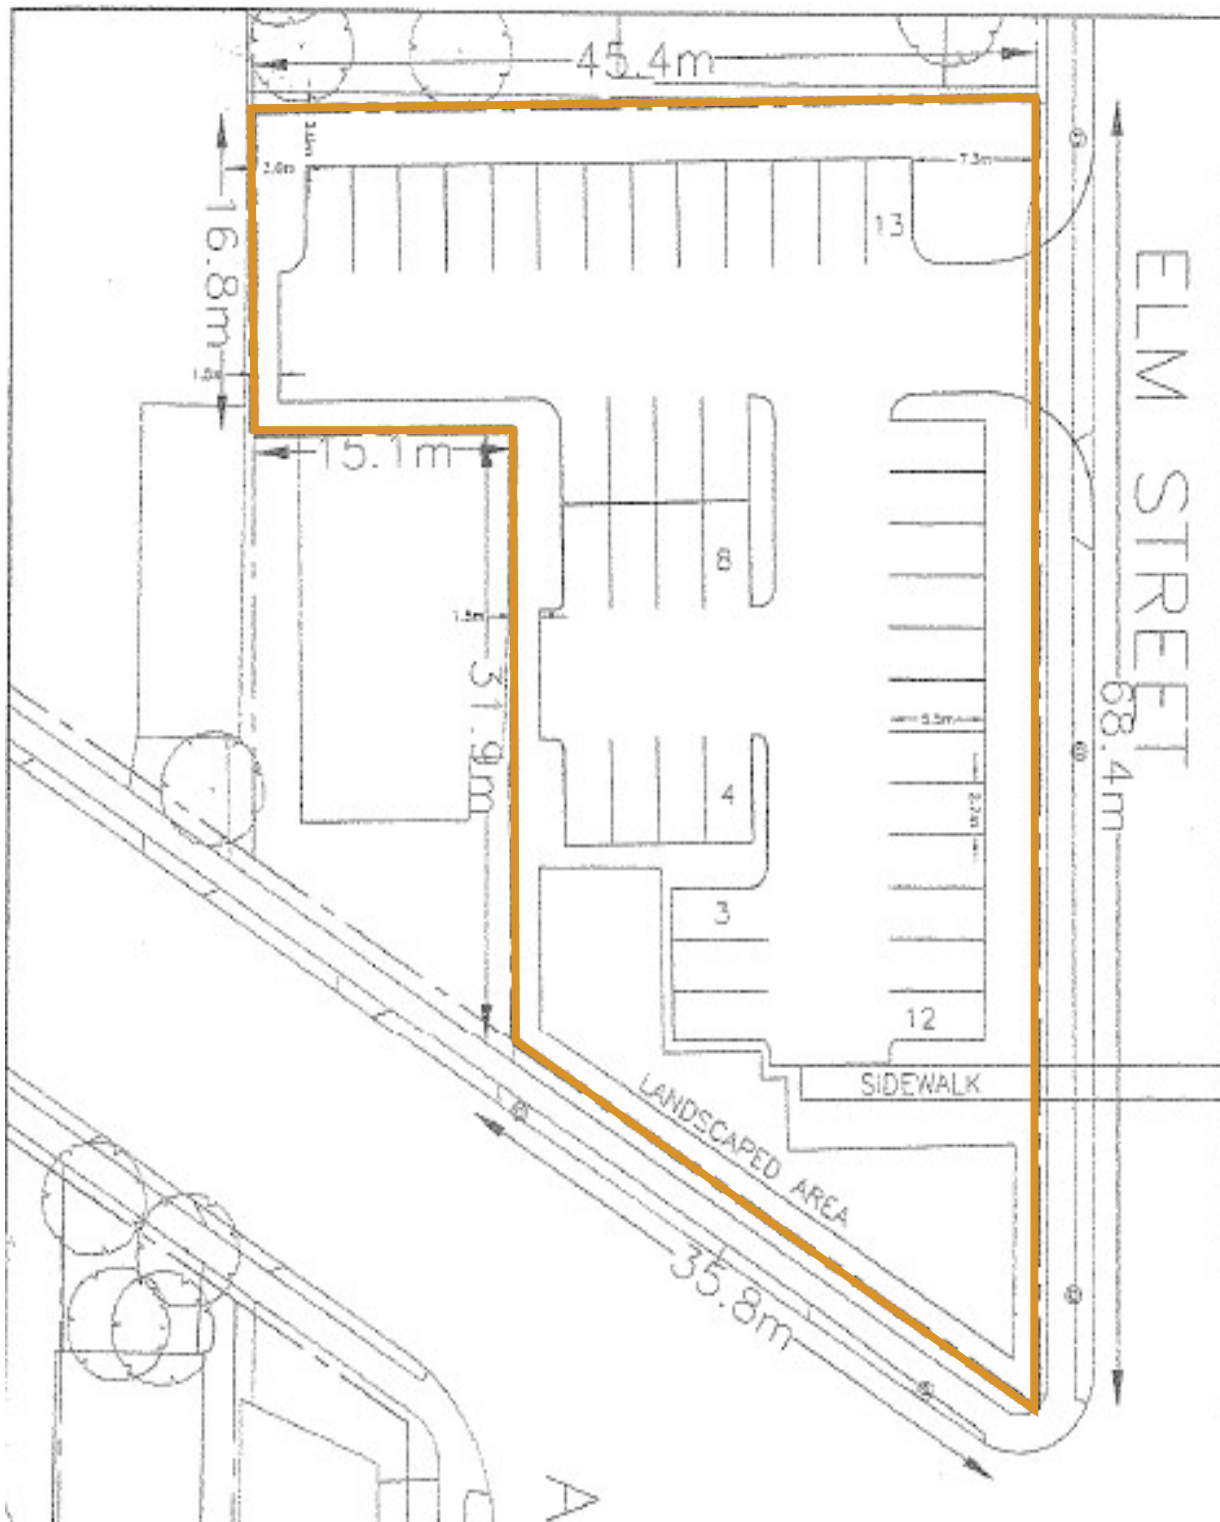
Concept plan showing the proposed parking layout on the 672 Hamilton Road property Source: Zelinka Priamo Ltd., Concept Plan 1 dated September 2019.
